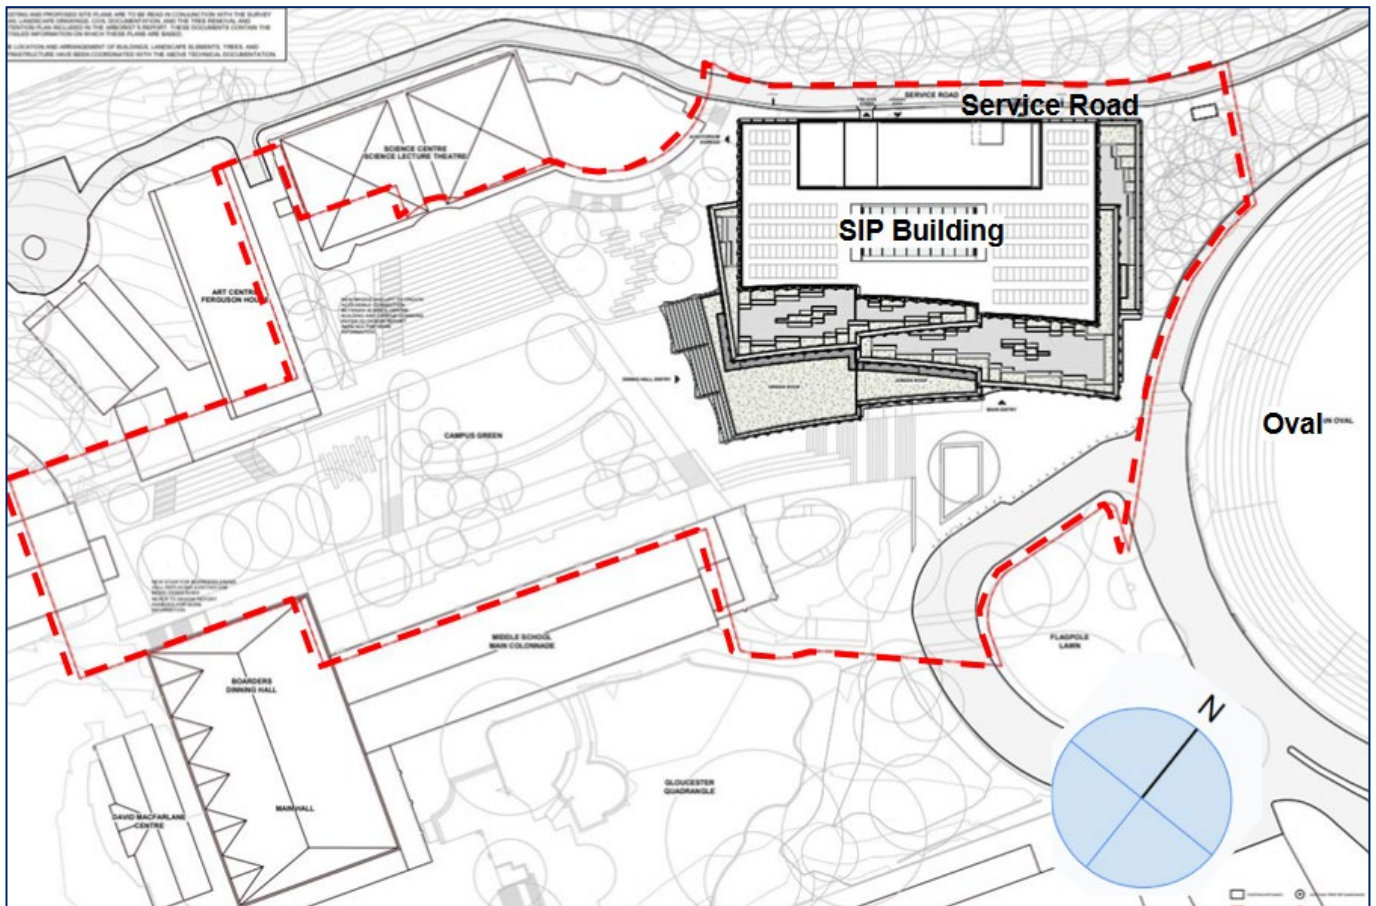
| SIP – Site Plan (Base source: Applicant’s EIS 2025)
